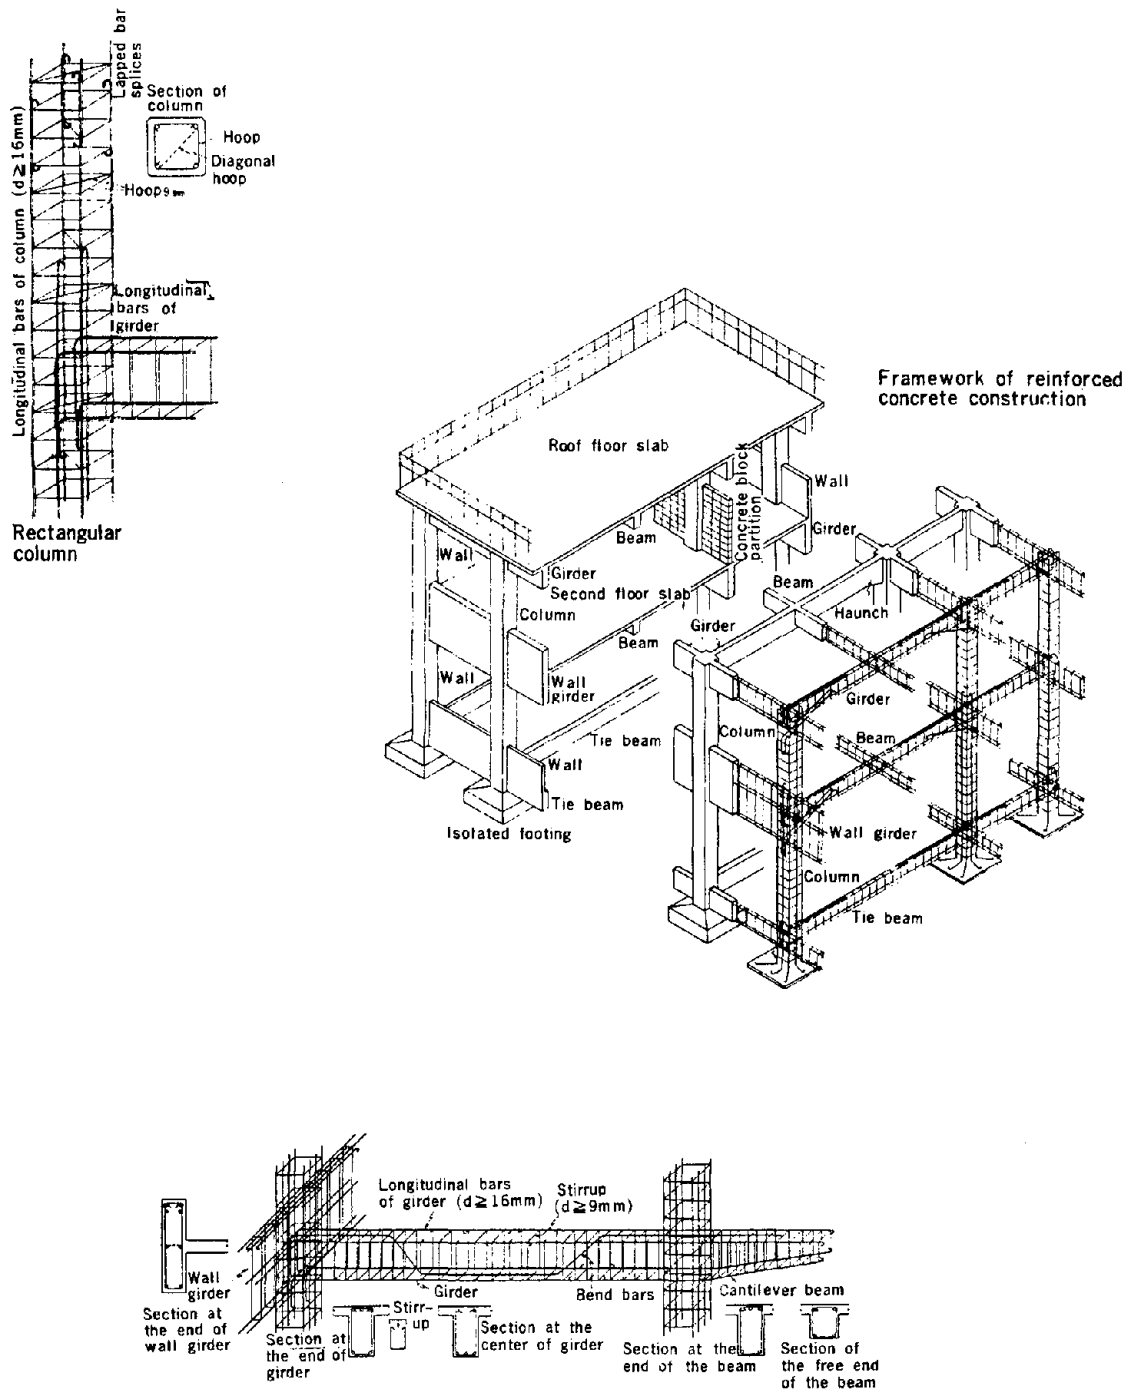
Reinforcement details for frame and frame-wall construction [AIJ, 1970]
